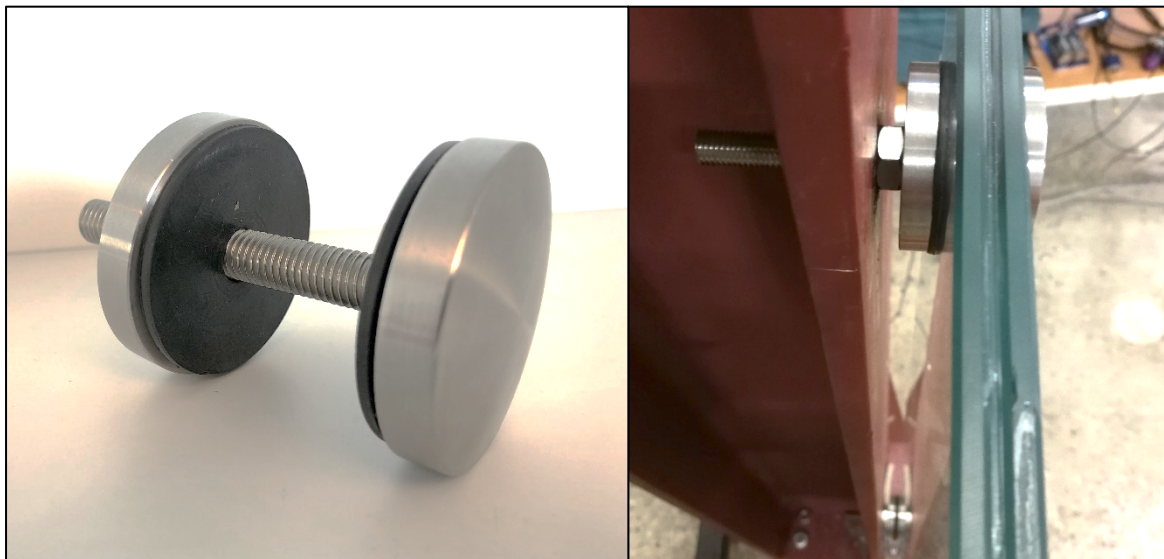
Close-ups of the bolt (left) and the bolted connection (right).
